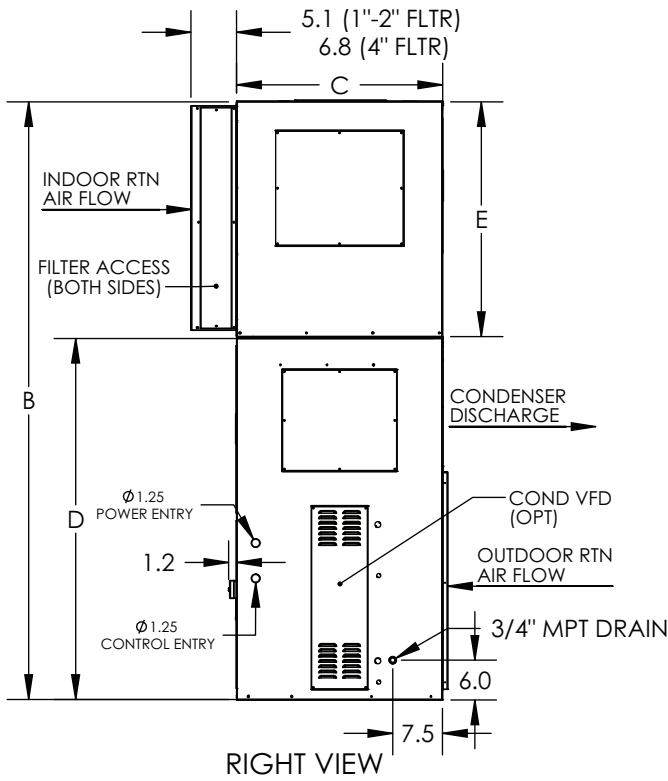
Base Unit Dimensions – 50XCA12,14 (Rear Return, Horizontal Discharge)
